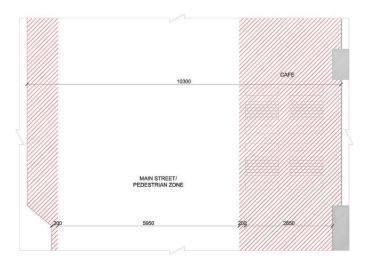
Street width and buffer spaces (in mm) for Gateway 3 in the area surrounding Luisenplatz in Darmstadt
